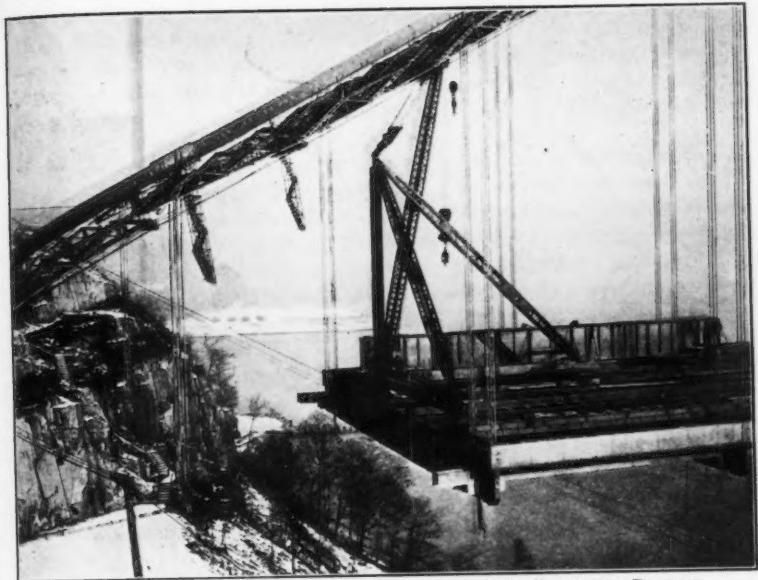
STEEL ERECTION IN SIDE SPANS; FLOOR-BEAM READY FOR PLACING.
